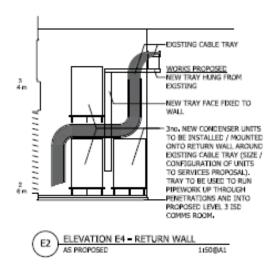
Elevation showing the proposed Condenser Units (Source: Architon)
